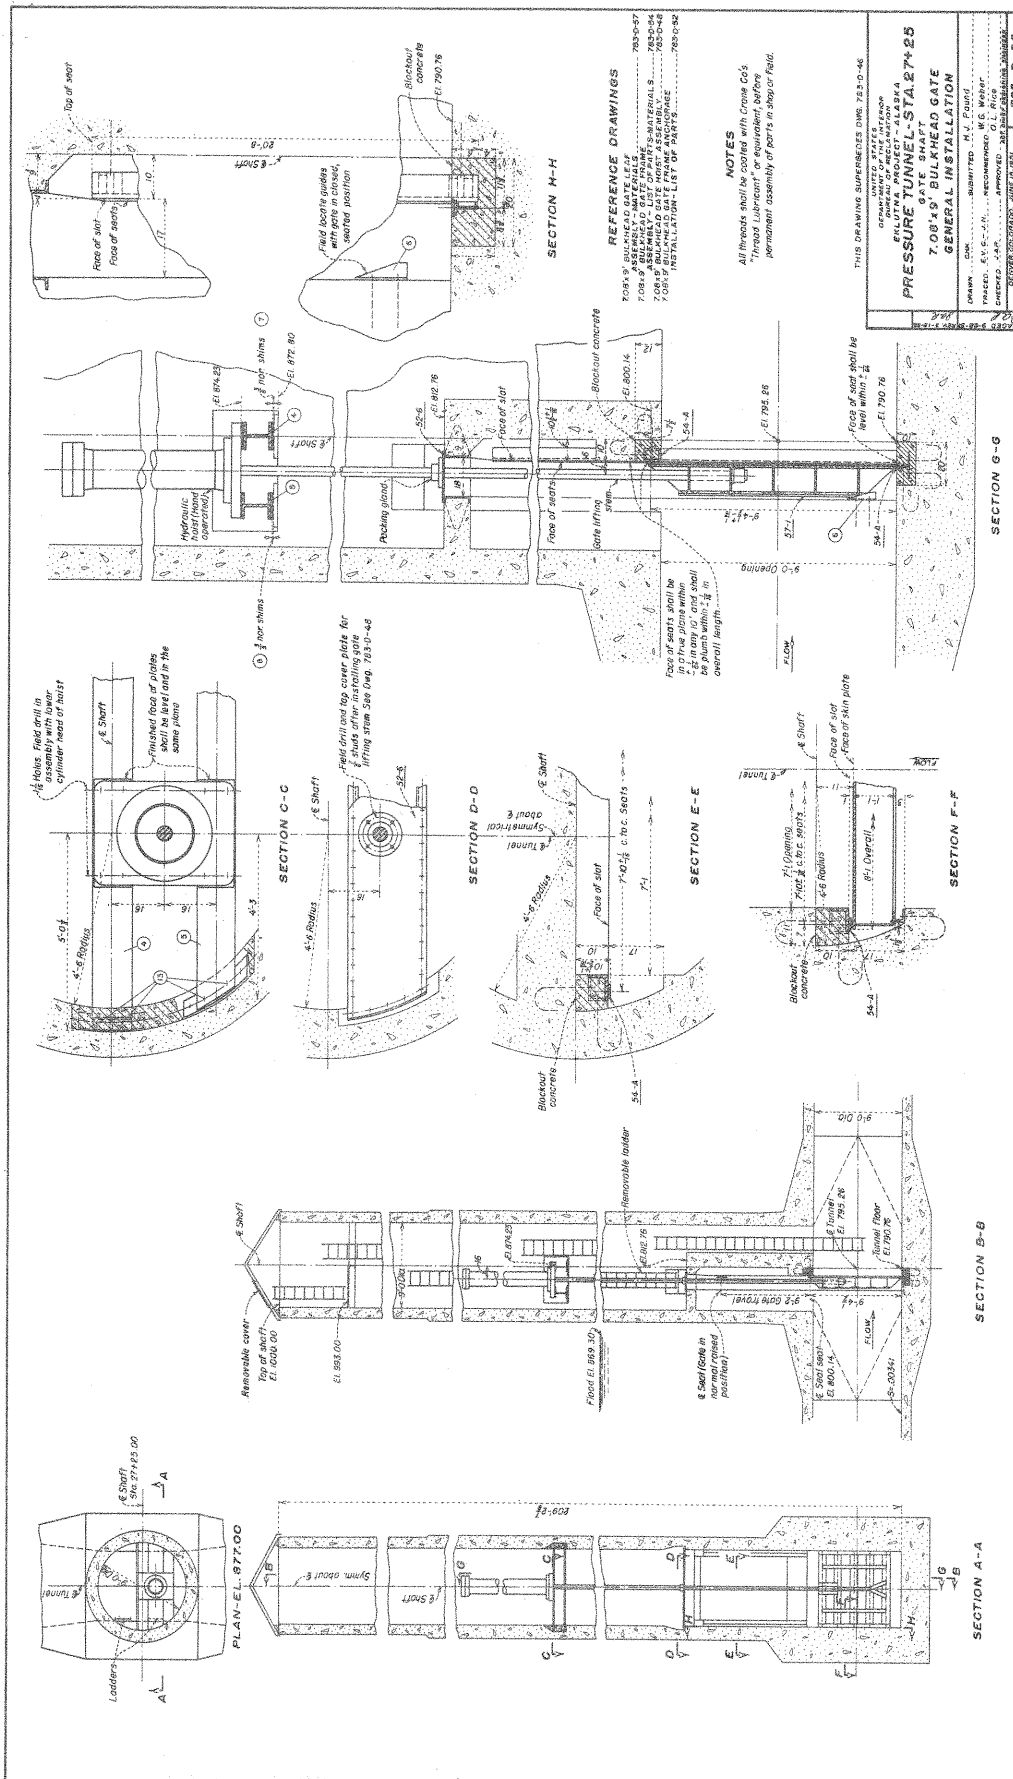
General installation of 7.08- by 9-foot bulkhead gate in pressure tunnel at station 27+25 (gate shaft).
